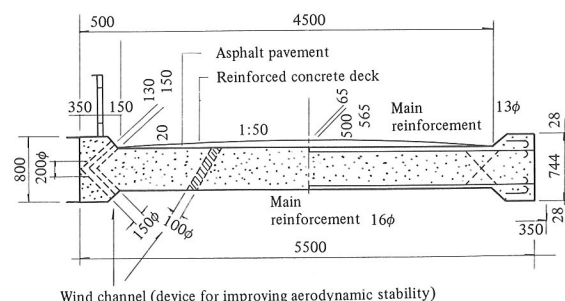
Cross Section of the Unstiffened Suspension Bridge with Heavy Deck
